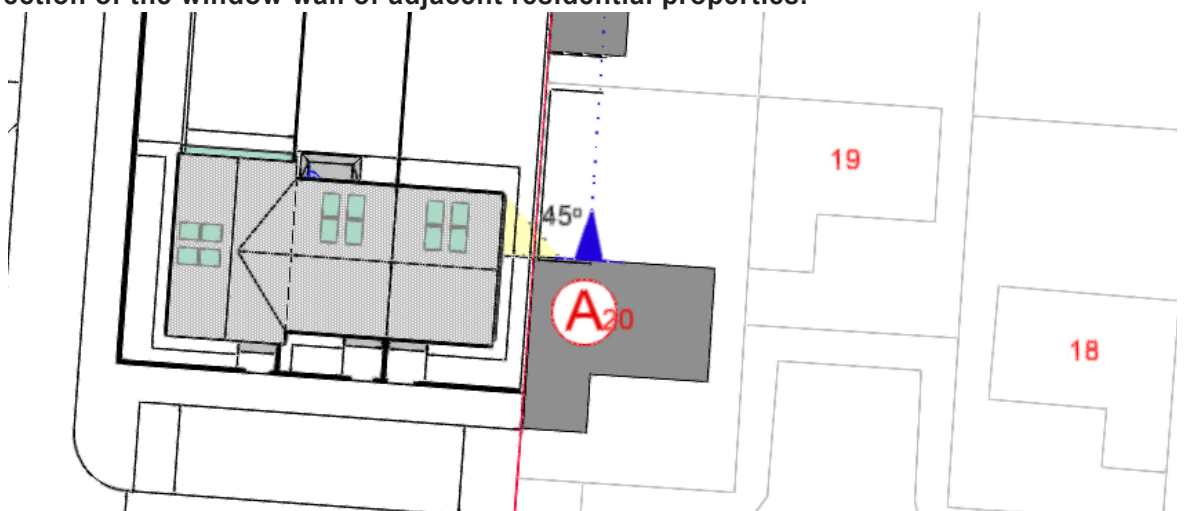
Site plan - Detail at location A, indicating the 45° angle in plan and the window wall of the closest residential property
